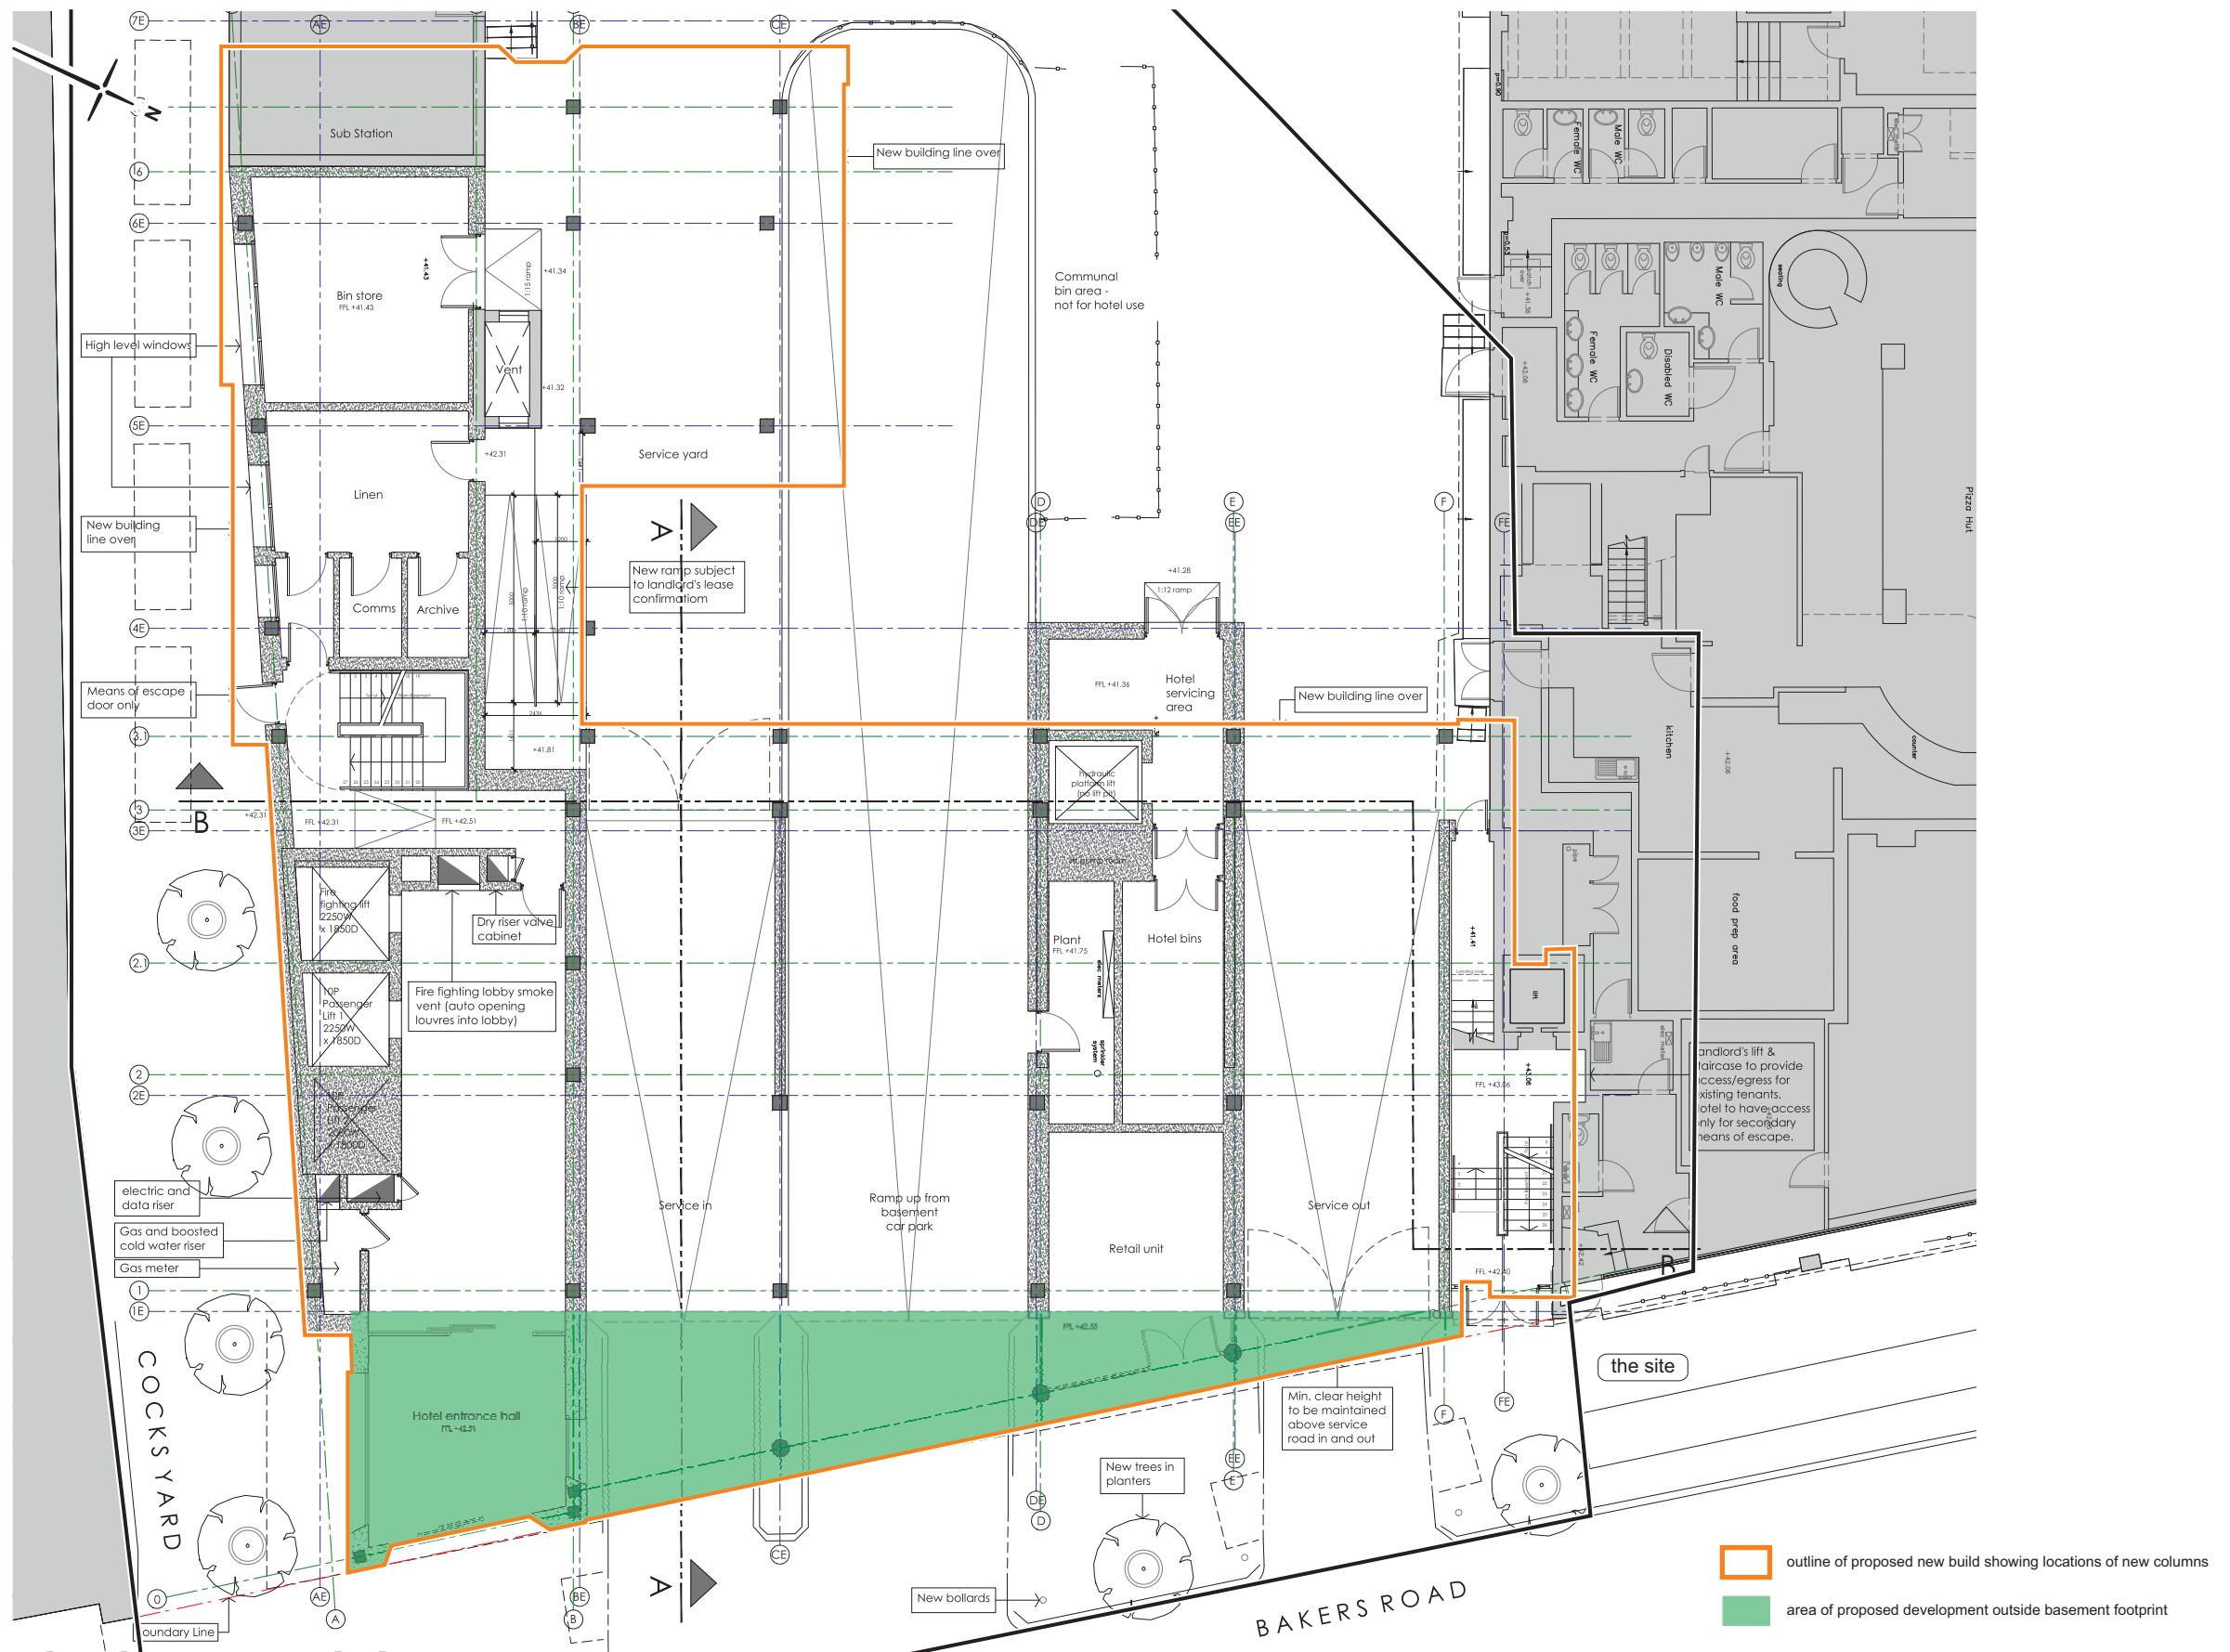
Ground floor plan showing area of proposed new build (Gaunt Francis architects, drawing no 12024/PL-P 100, Rev B, 12/12/2018)
